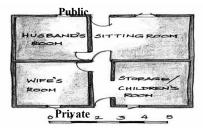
The floor plan of the house in figure 1, Mbuva. (Sketch: Nnaggenda-Musana. 2004)
